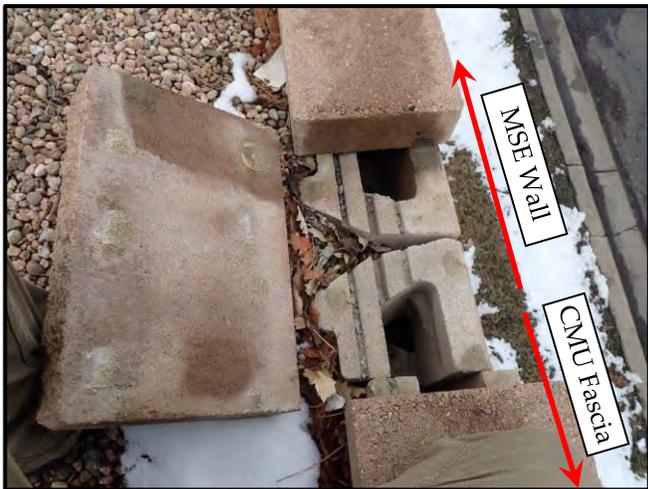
Capstone removed at construction joint between MSE wall and CMU fascia wall
